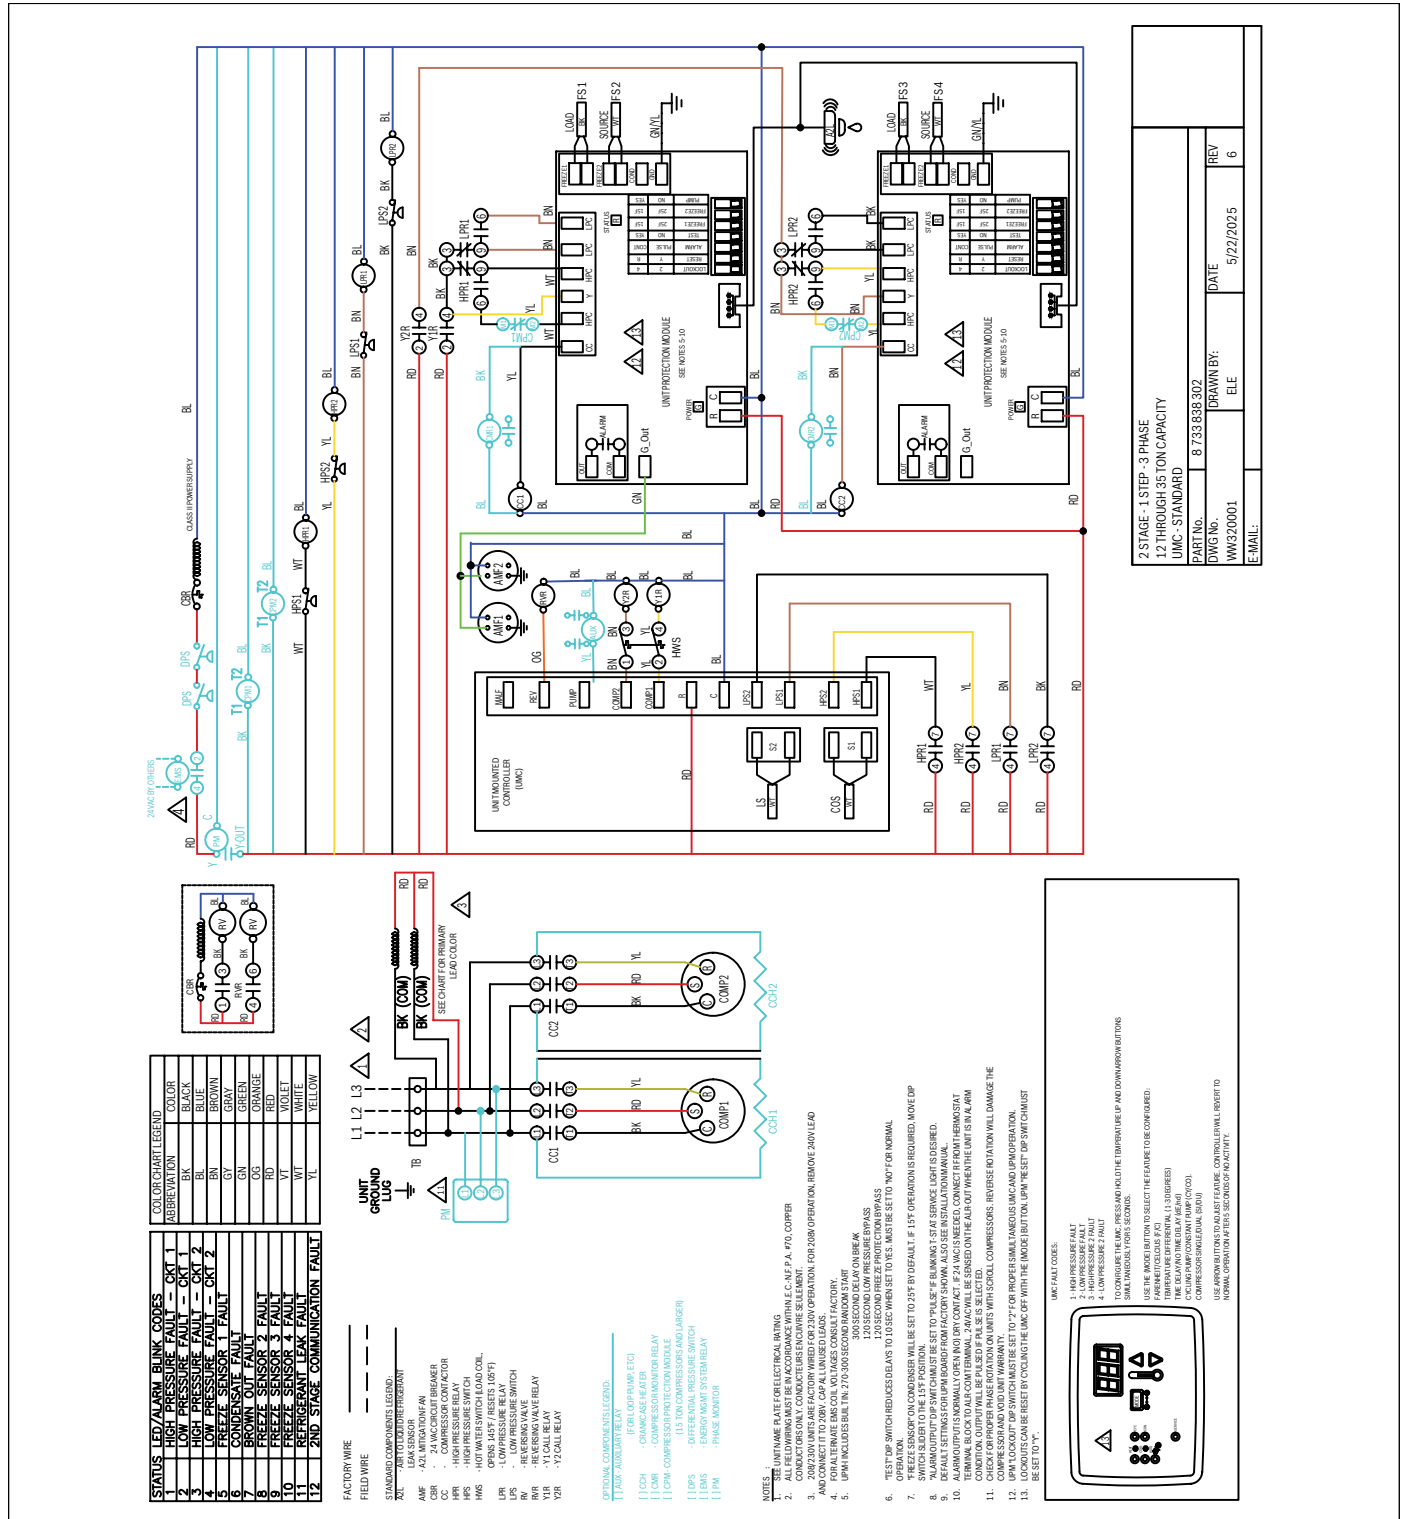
WW240, WW360, WW420, Unit Mounted Controller
